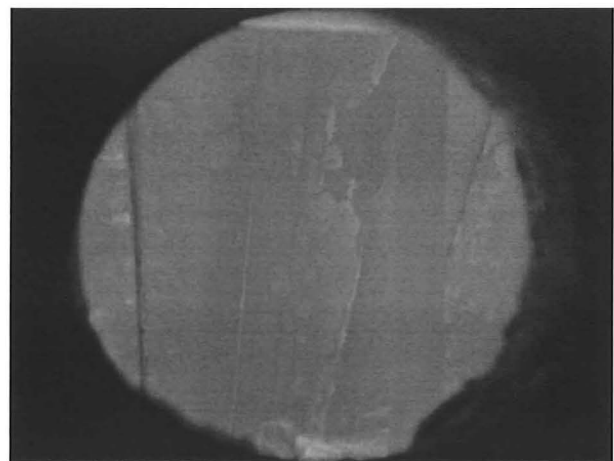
Debonding of the steel decking and diagonal cracks forming at the rib-slab intersection.
